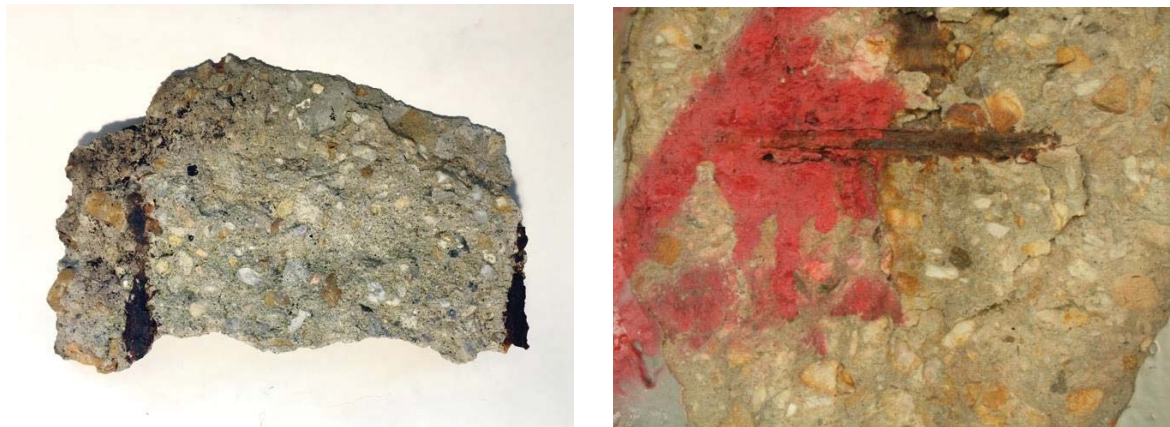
Left photograph shows a concrete piece fallen from the concrete column of the bridge at Denbigh, VA. Infusion of iron oxide takes place in the porous structure of the concrete and fine cracks are seen all over the surface. Right photograph shows the fine cracks in concrete layers, prior to the spalling of layers.
